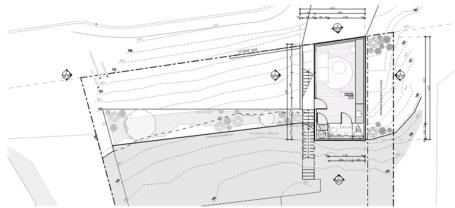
Upper floor (studio) (Crump Architecture, 2022)
